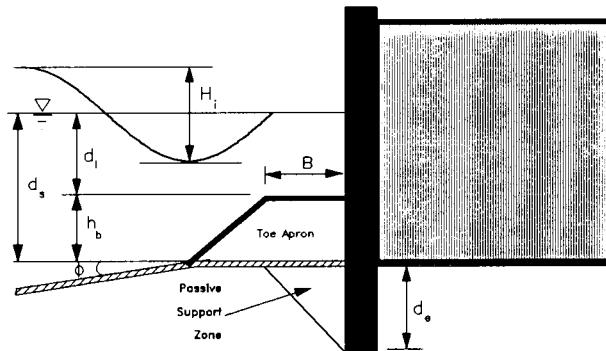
Typical Toe Apron for Sheet-Pile Walls
